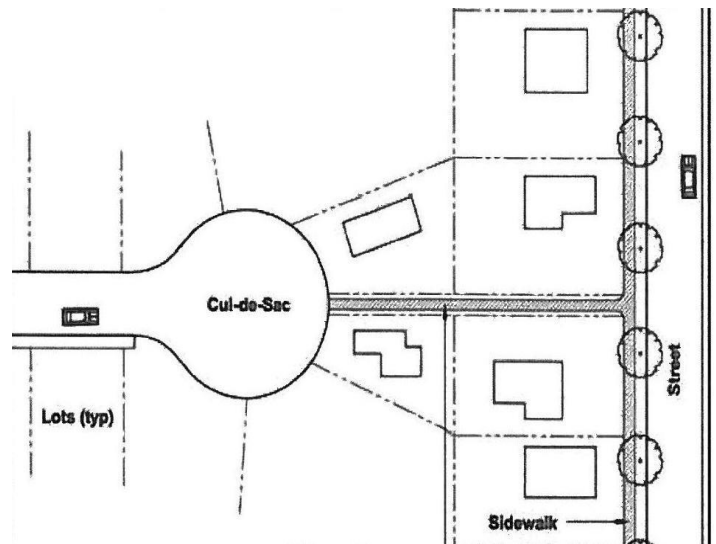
A: 10 ft. access easement from head of cul-de-sac to nearest street or path
